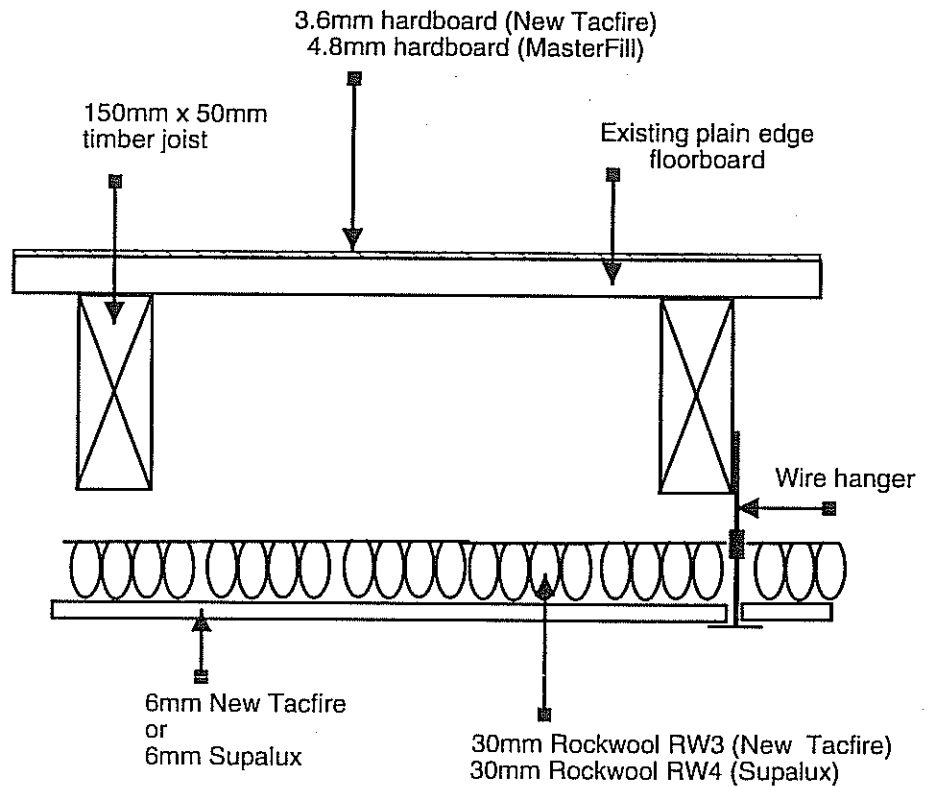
Use of Rockwool and New Tacfire or Supalux to provide a suspended ceiling of 60 minutes fire resistance
